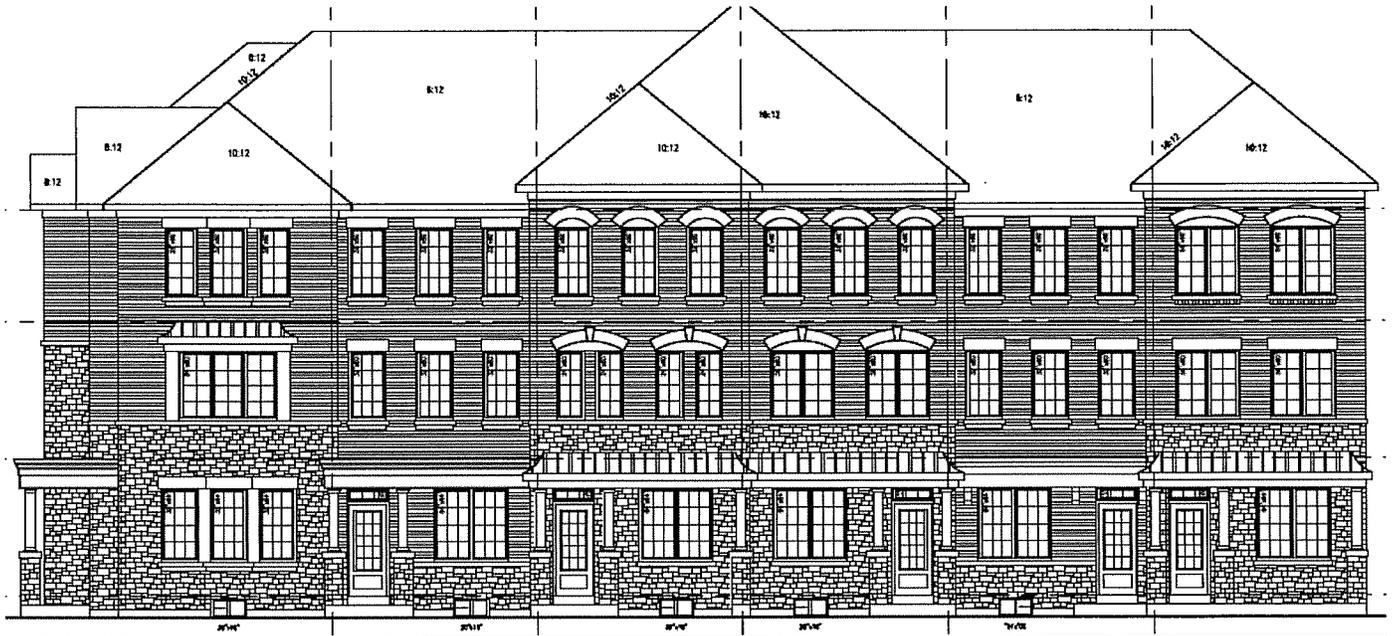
Conceptual Elevations (Sheet 3 of 6)
